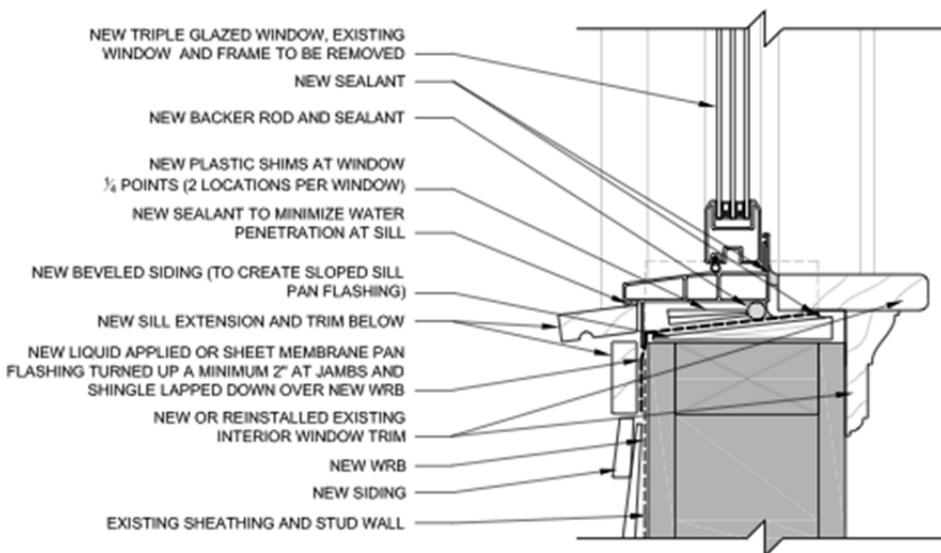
Example sill detail of replacement window in conjunction with siding replacement
